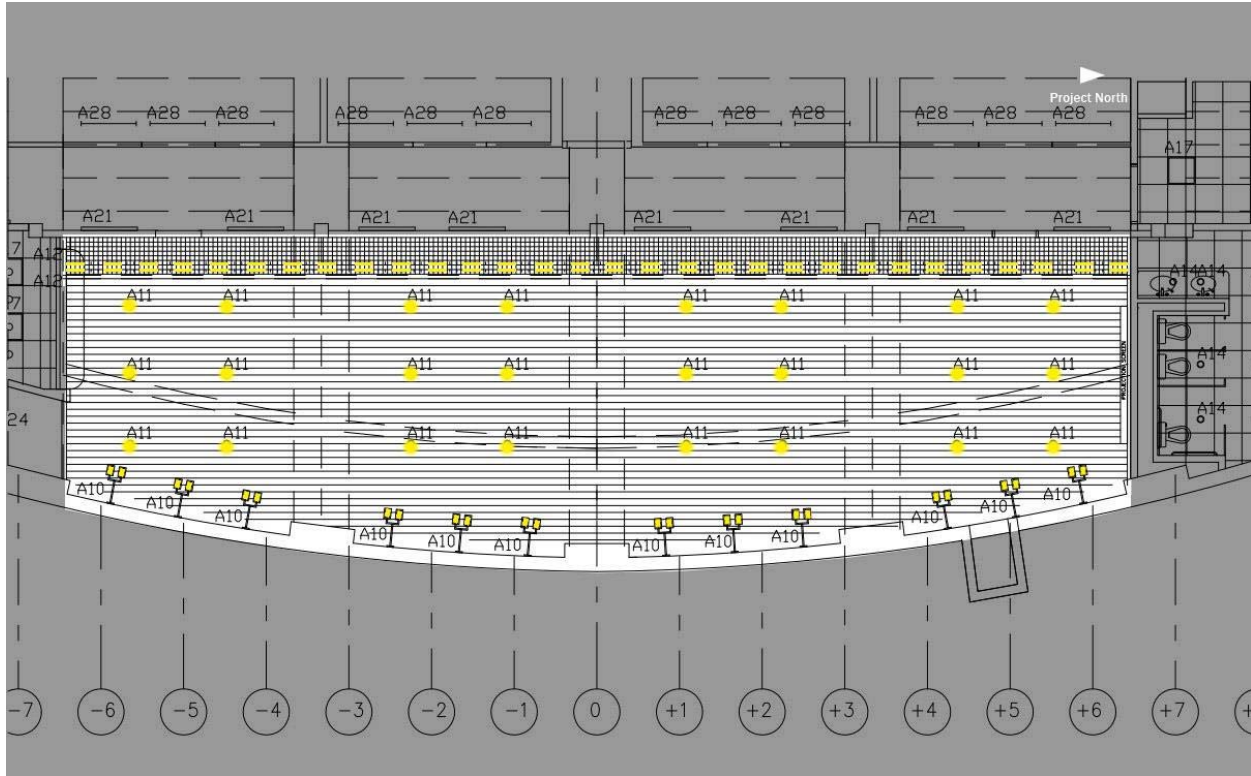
| Existing Lighting Plan – Schley Memorial Club Room
